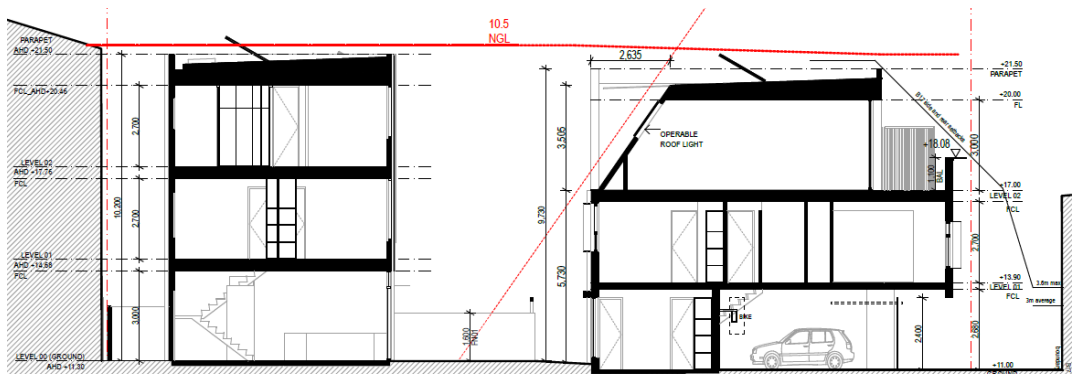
Raked southern walls of TH02 – TH05 shown in section (applicant submission, December 2020)
